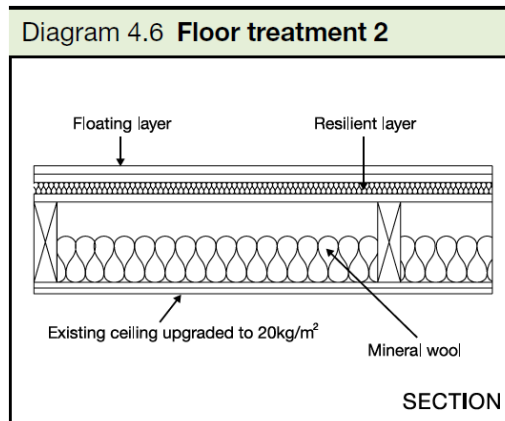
Suggested new ceiling scheme for additional sound insulation for the floor between ground floor and upper floors, and a platform floor with absorbent material. (Approved Document E, page 61 section 4.31/4.32/4.33/4.34 for details).
